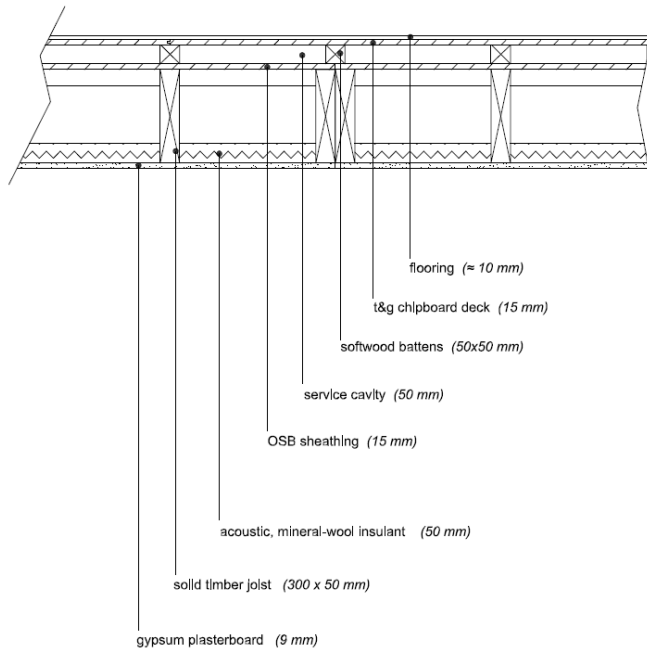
Intermediate floor B (timber frame, cassetted floor), cross-section.
